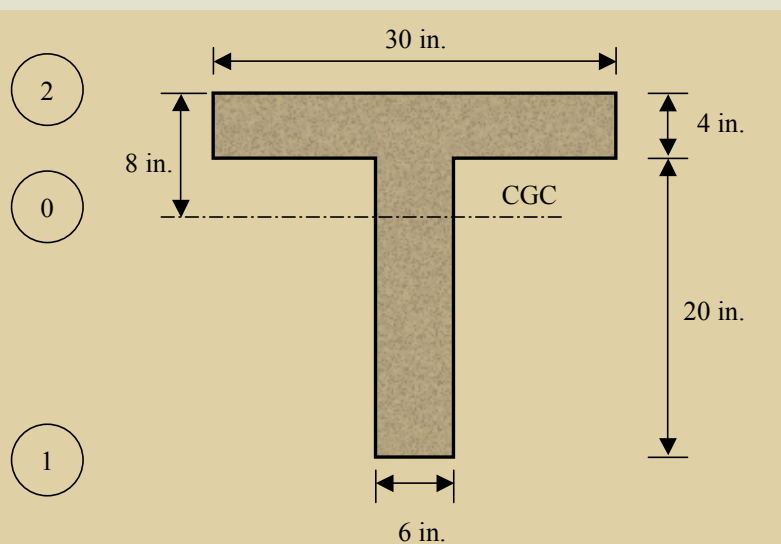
The cross section of the concrete T-beam used in the example. Note: CGC = center of gravity of the concrete. 1 in. = 25.4 mm.
